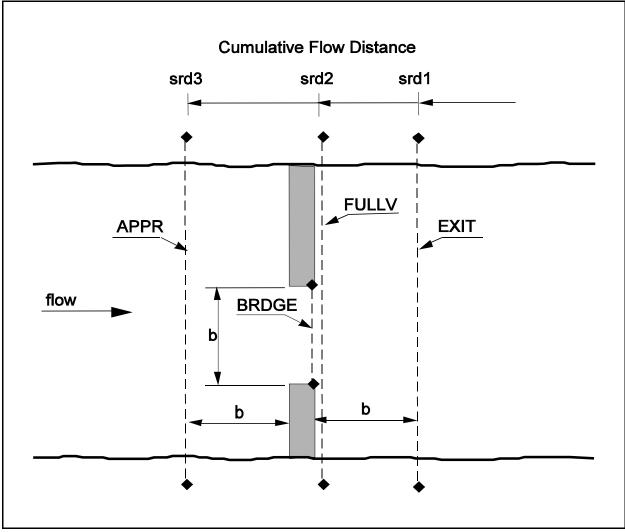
Definition sketch: cross-section locations, single-opening bridge.
